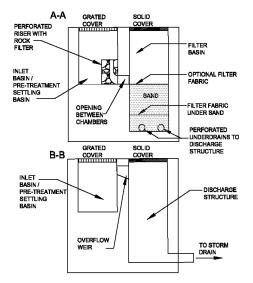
Plan View Schematic Detail, Typical System C Filter Array.
